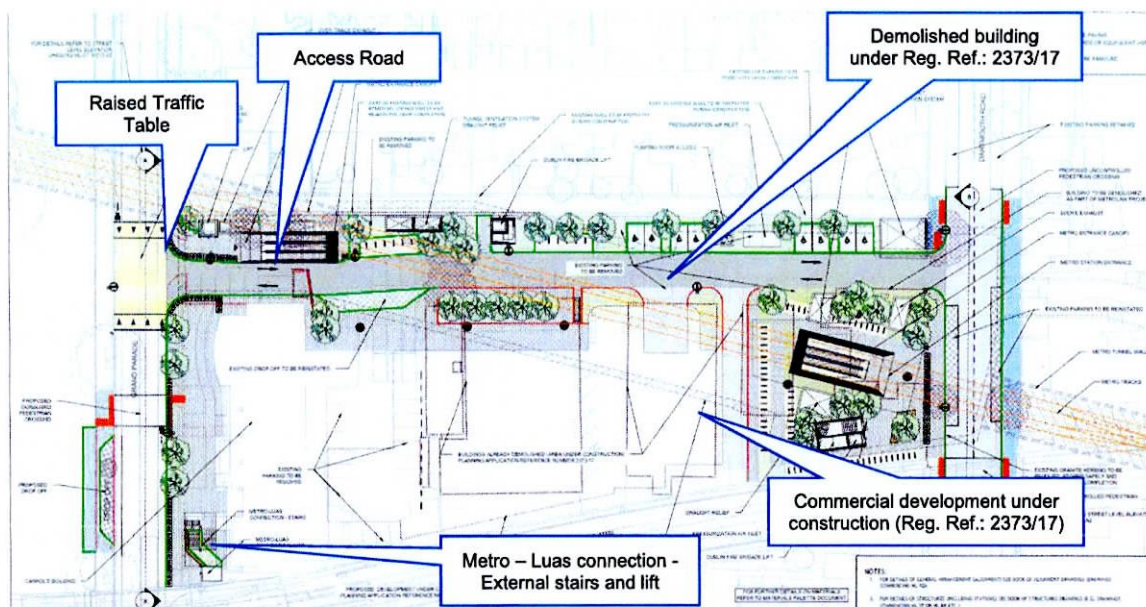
Extract from drawing 'Railway Works MetroLink – Structures Charlemont Station Proposed Street Level Design'
